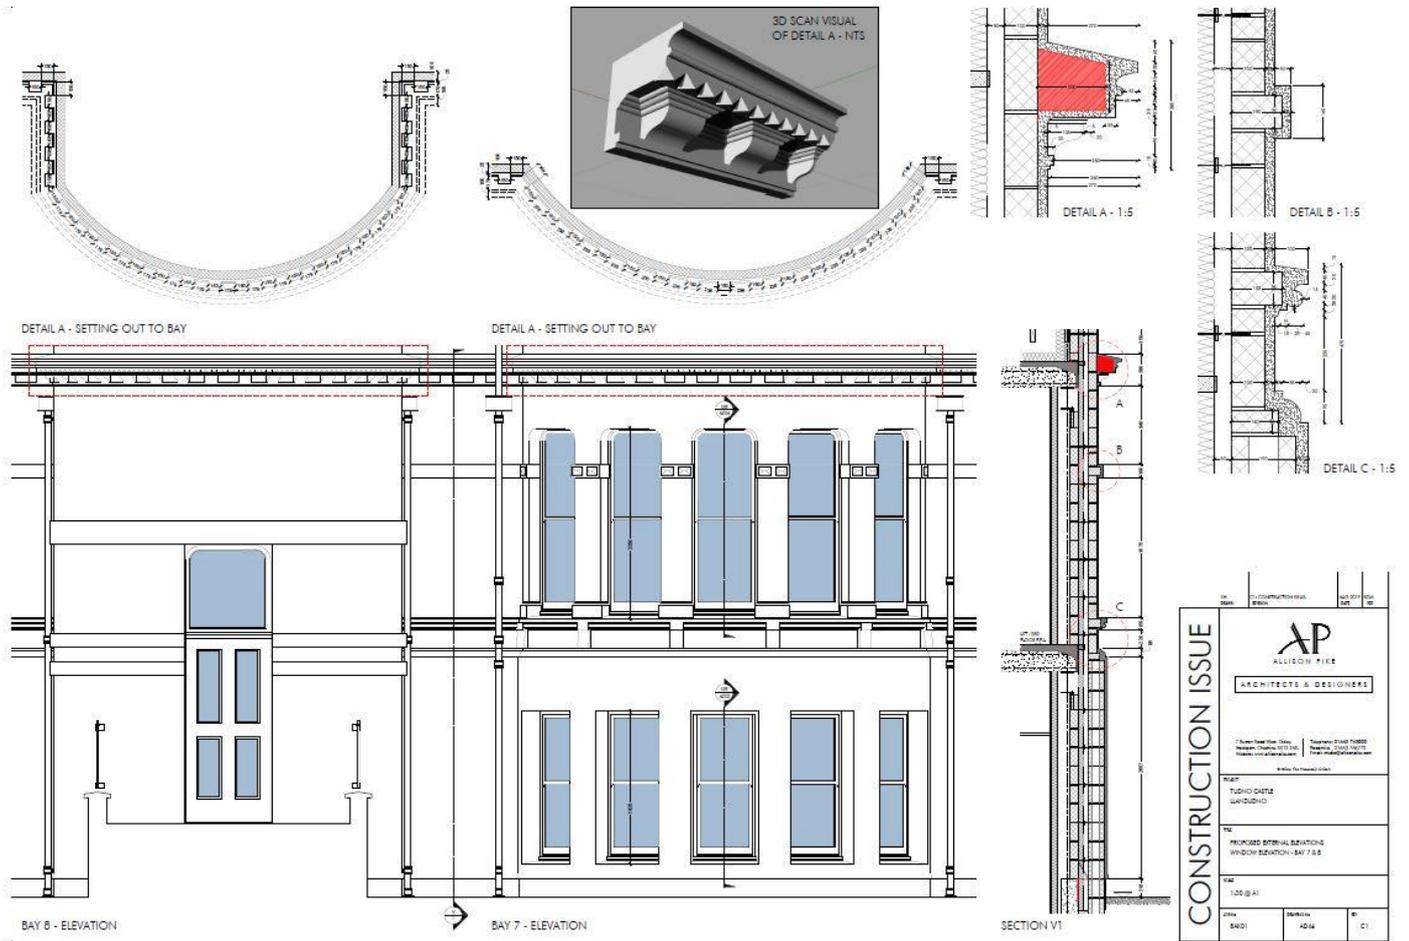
Extract of typical new wall detail with masonry cavity wall construction faced in traditional stucco render and detailing with the aid of 3D scan software
